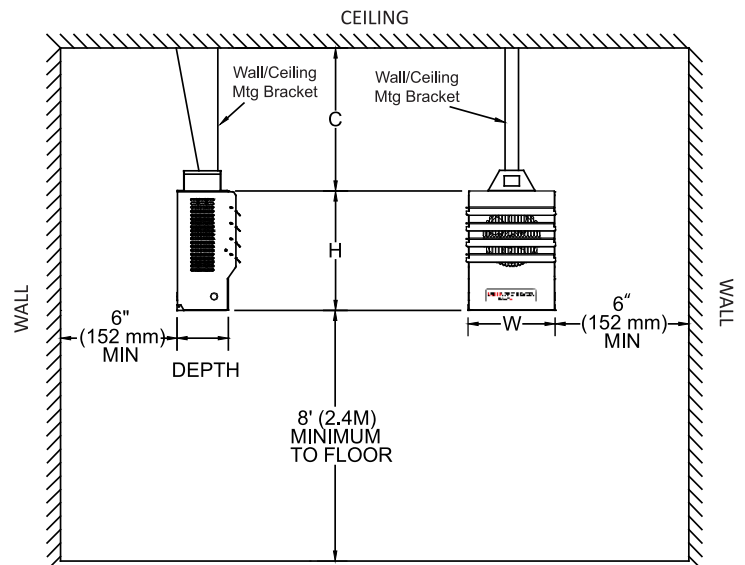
HORIZONTAL CEILING MOUNT WITH MTG ARM
